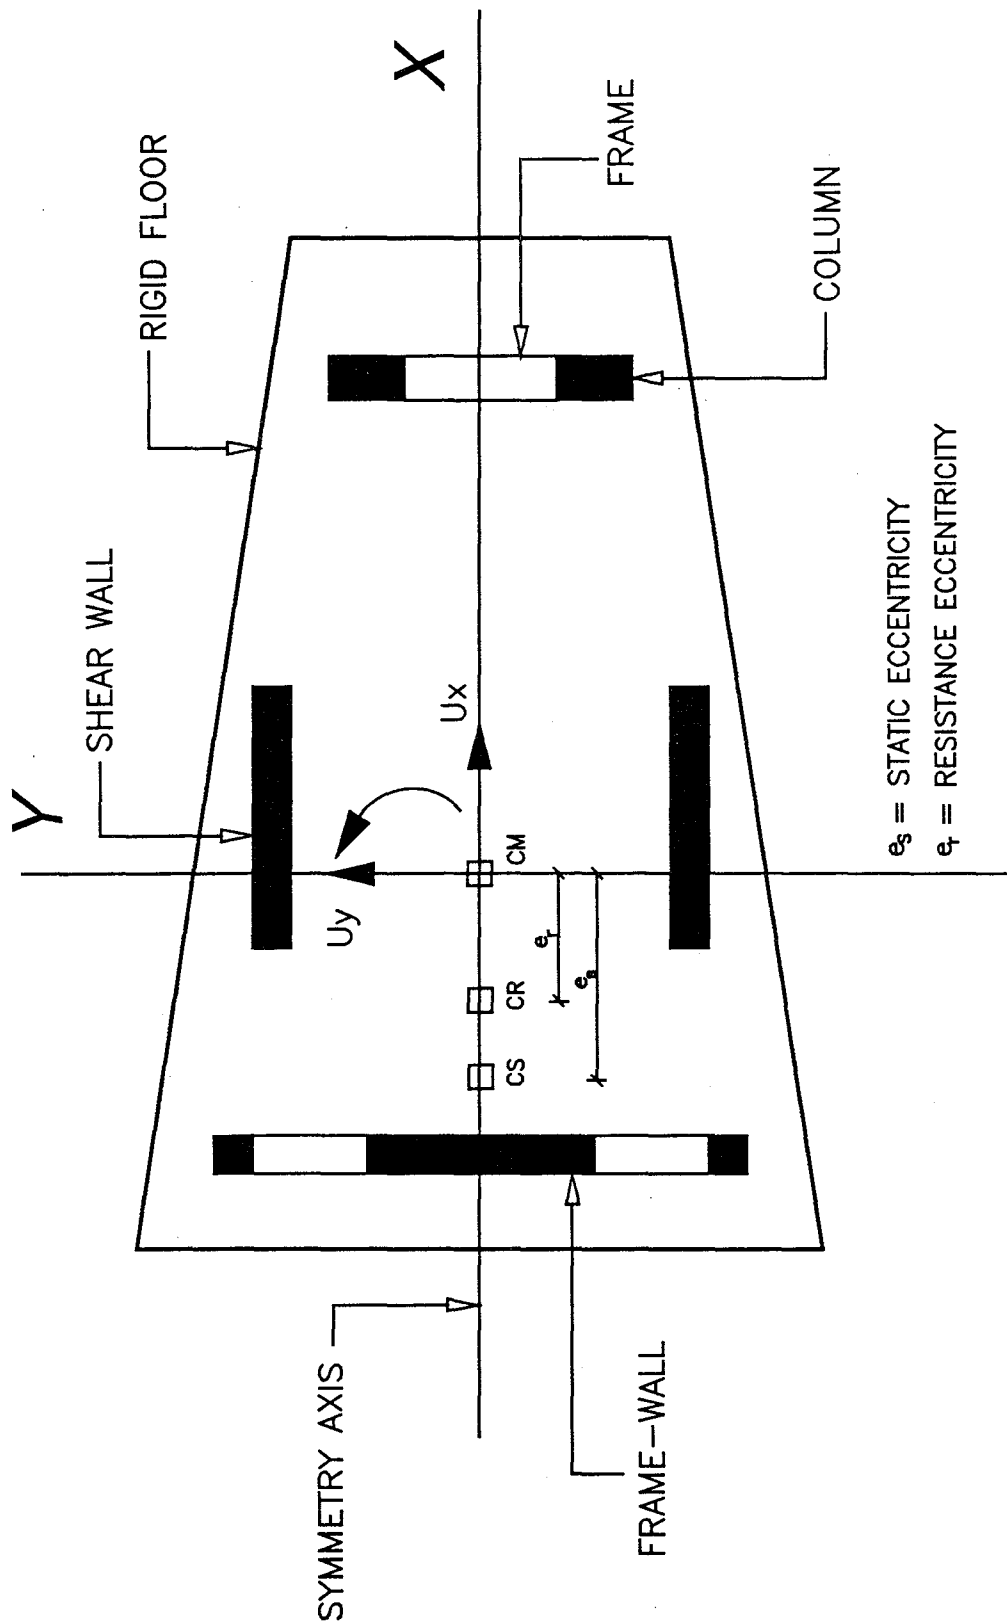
PLAN VIEW OF A TYPICAL SINGLE STORY SYSTEM
